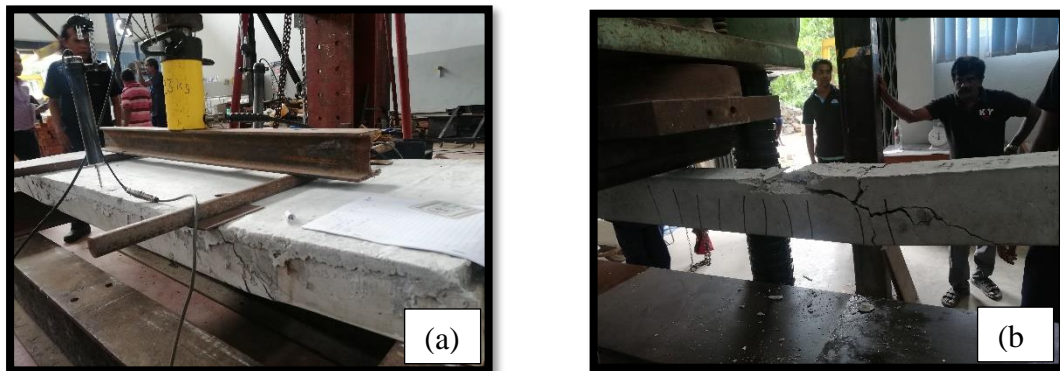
Crack pattern (a) composite slab (b) pre-stressed beams
